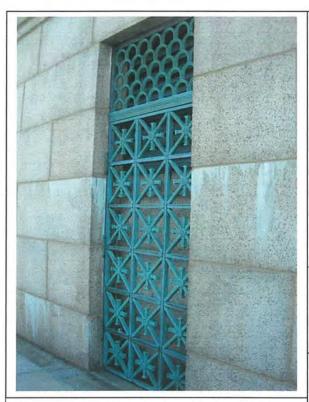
Typical vent opening and grillwork of exterior penthouse walls, looking southwest.
